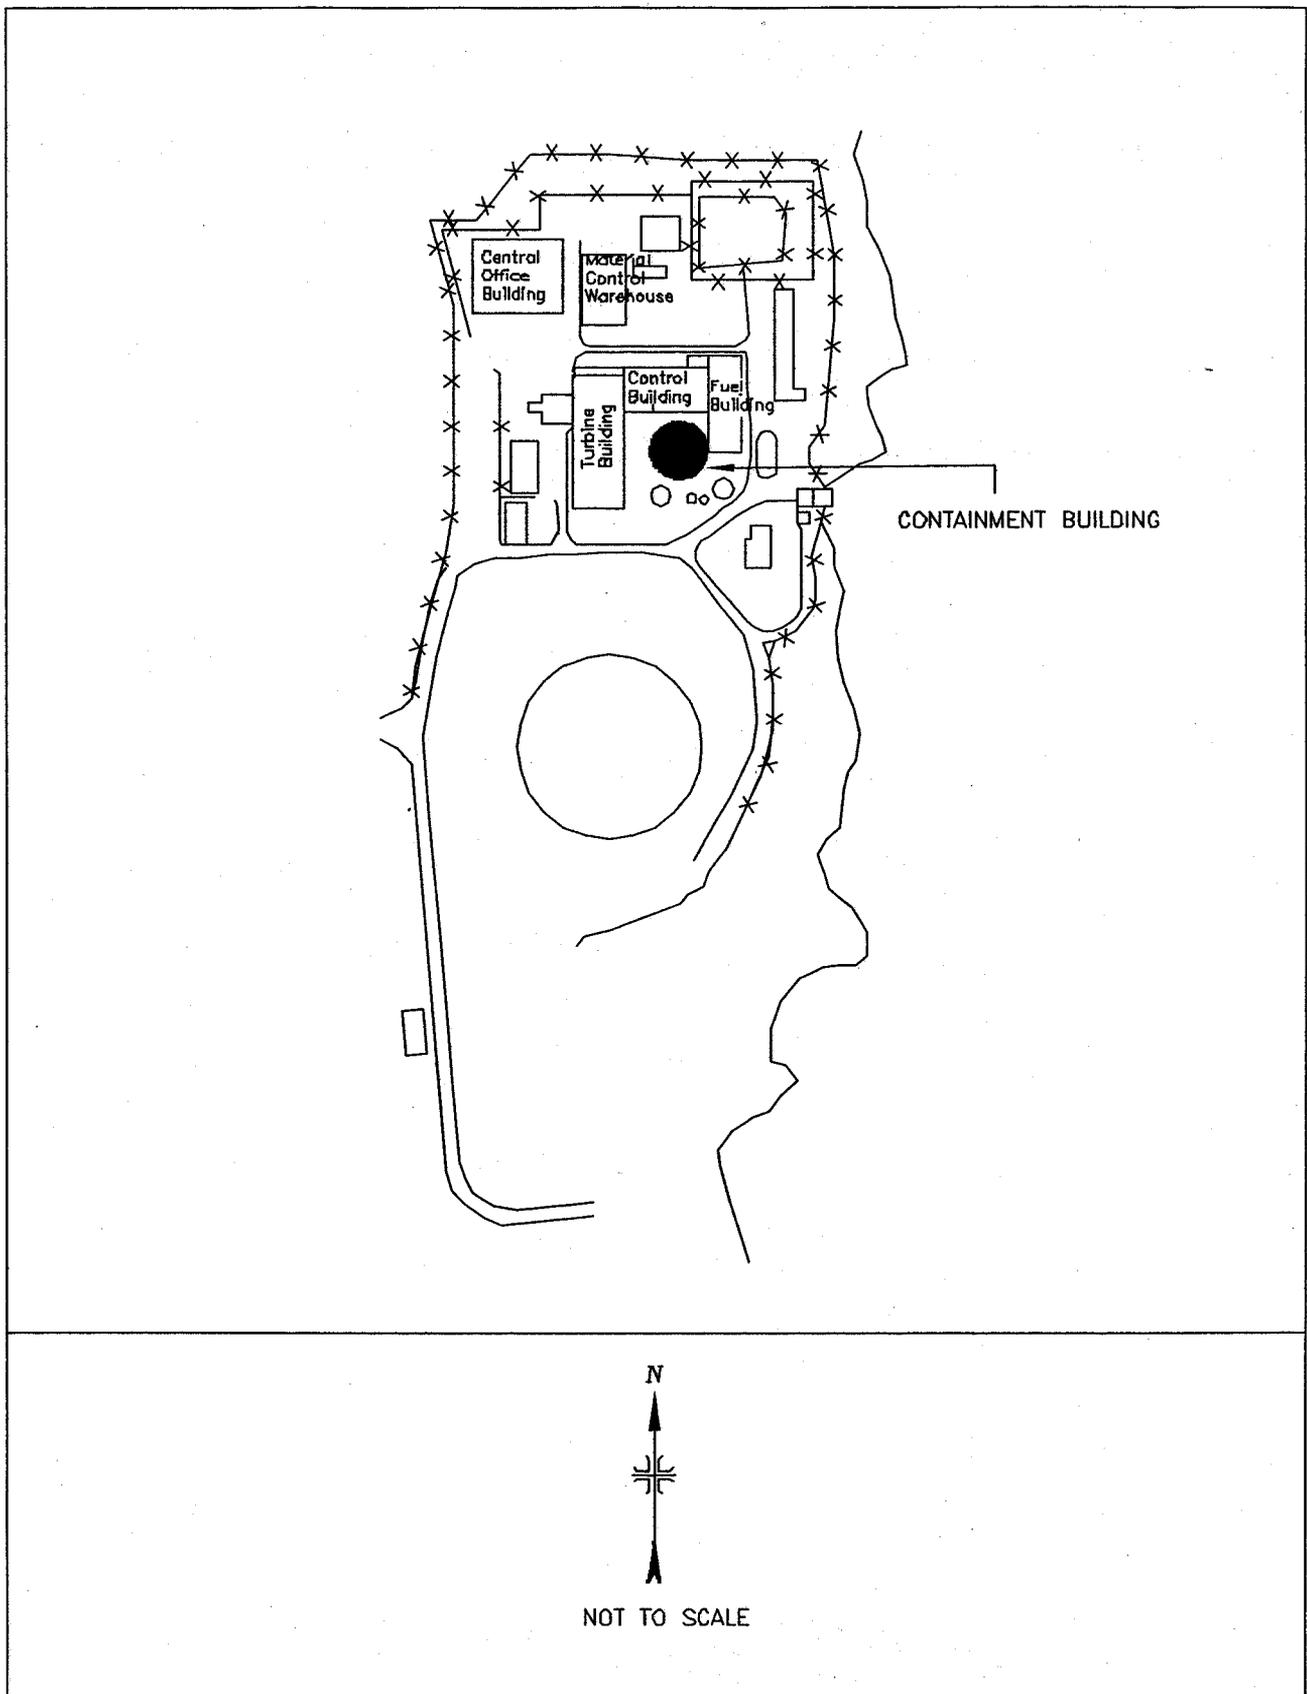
Trojan Nuclear Plant - Location of Containment Building
